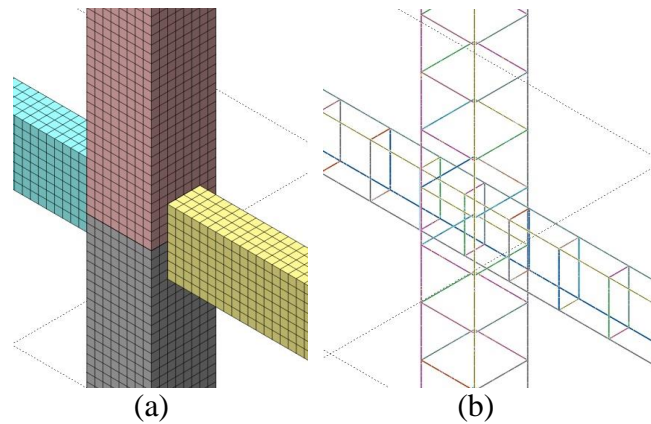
Modeling of the frame with Midas FEA: (a) concrete, (b) reinforcement.
